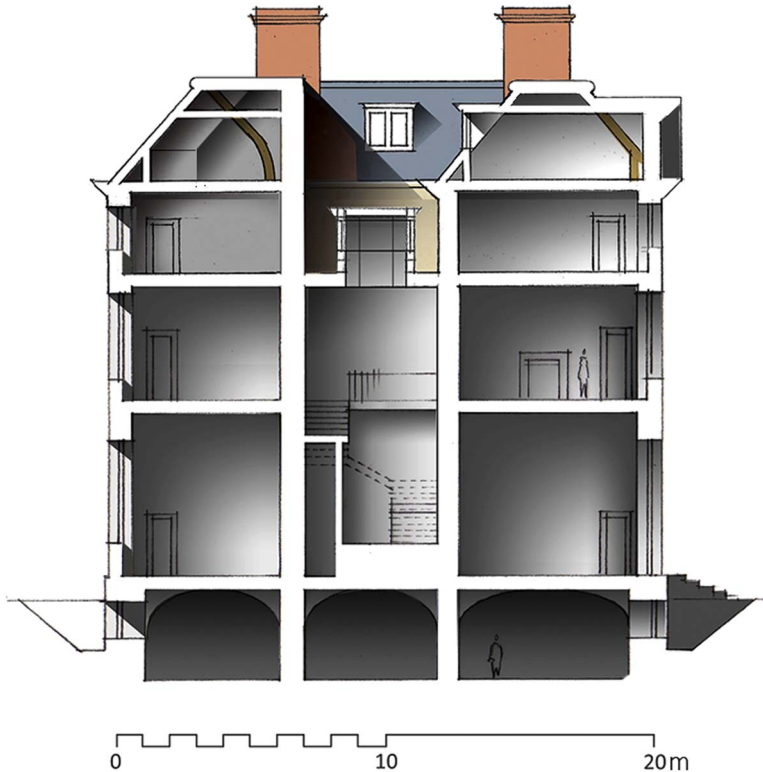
Moor Park: east-west section looking north; lantern conjectural. *Drawing:* David Wrightson
